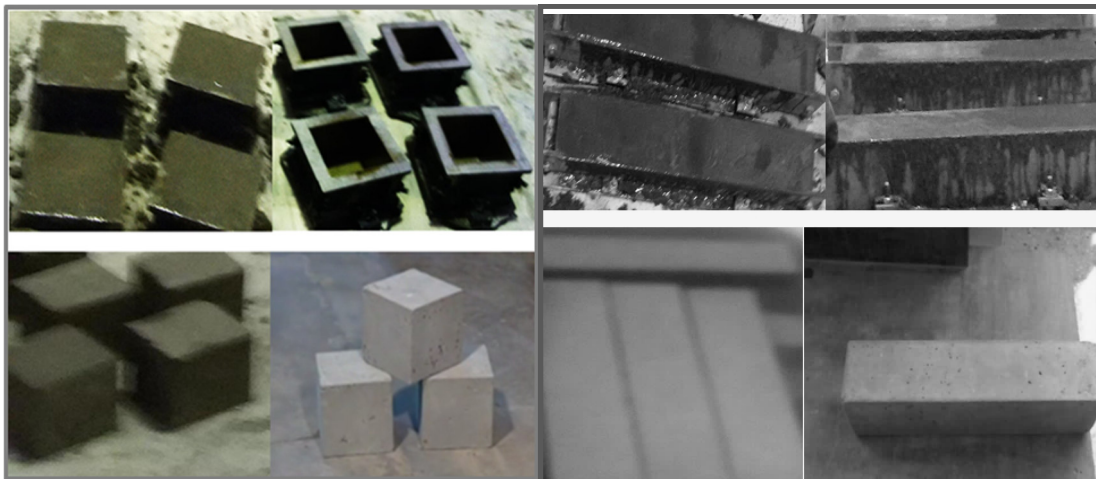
Cubic and Beam specimens UHPFRC used for testing
